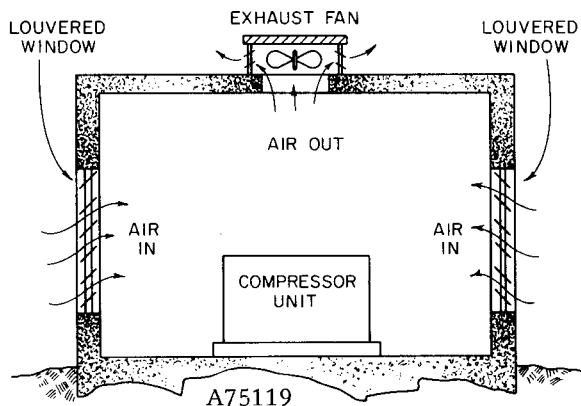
TYPICAL COMPRESSOR ROOM
